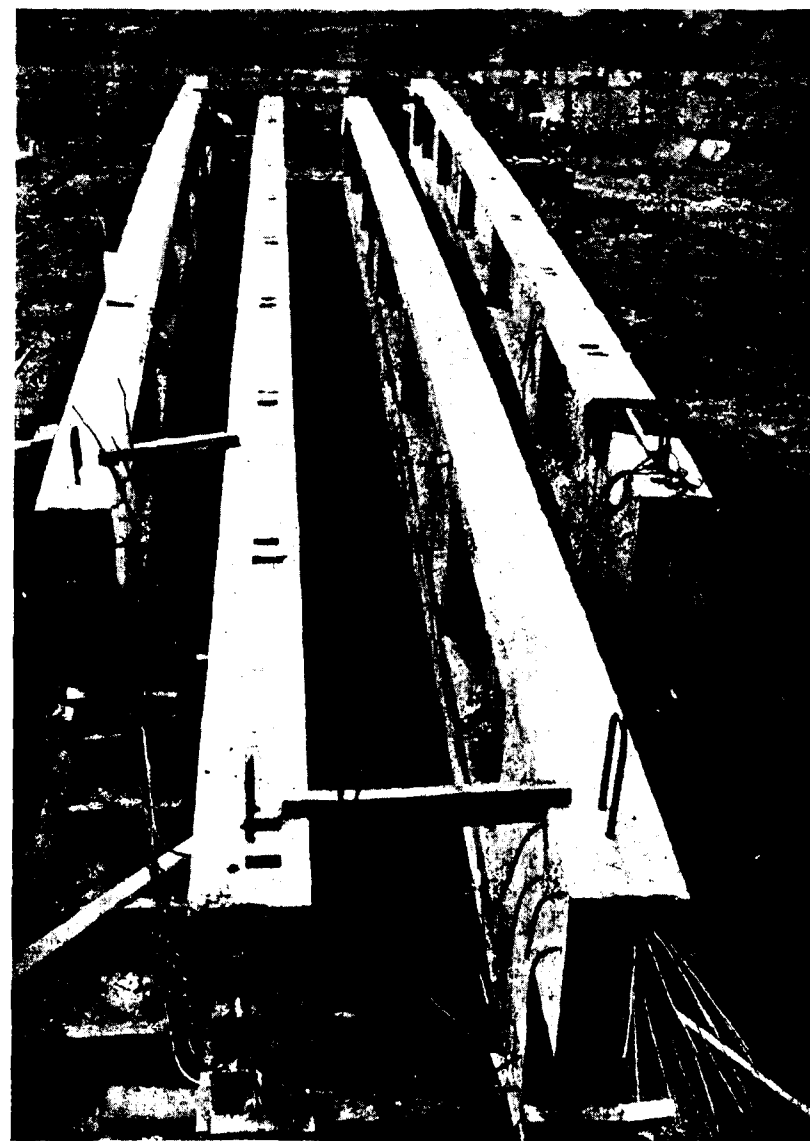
Castle Bridge Shrewsbury—Suspended span girders ready for launching.
